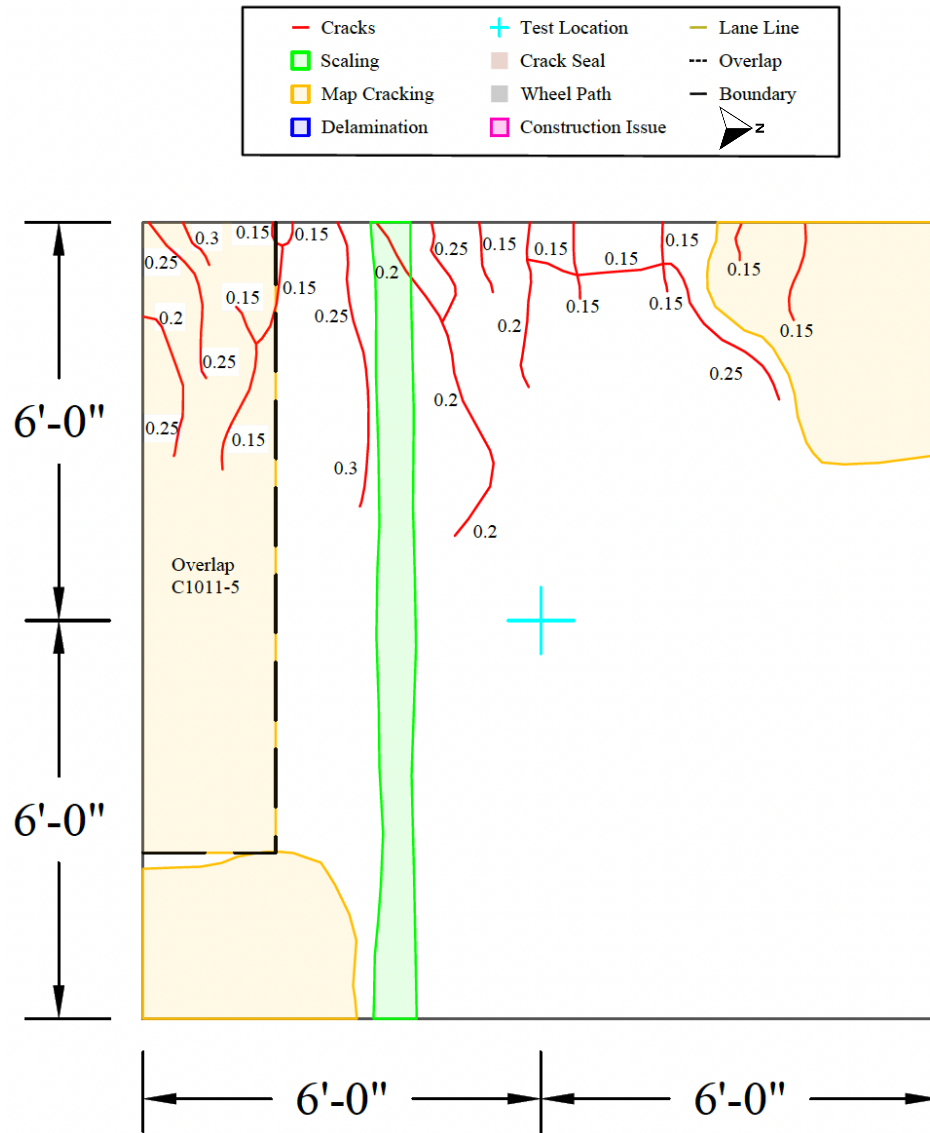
Test location 4 of lightweight concrete deck at bridge C-1011.
